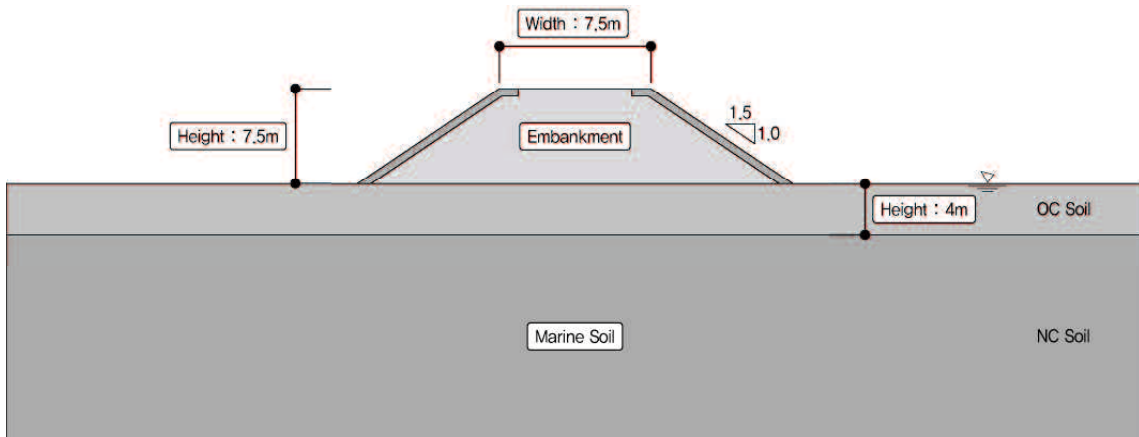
Typical cross section of embankment on marine subsoil at Incheon site
